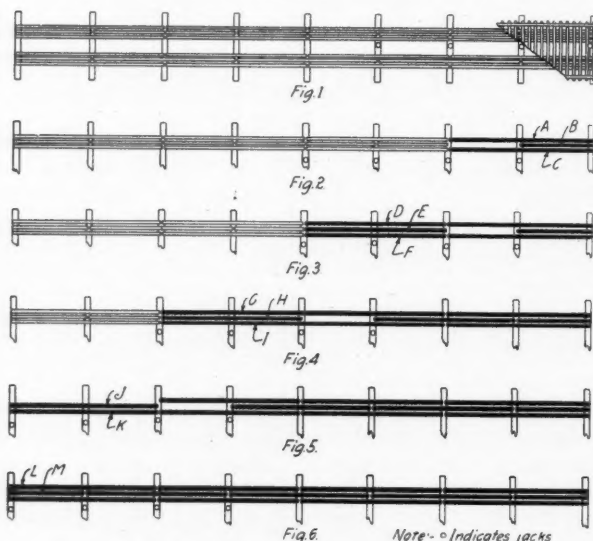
shows the old stringers removed in spans 3 and 4 and stringers D, E and F placed.
